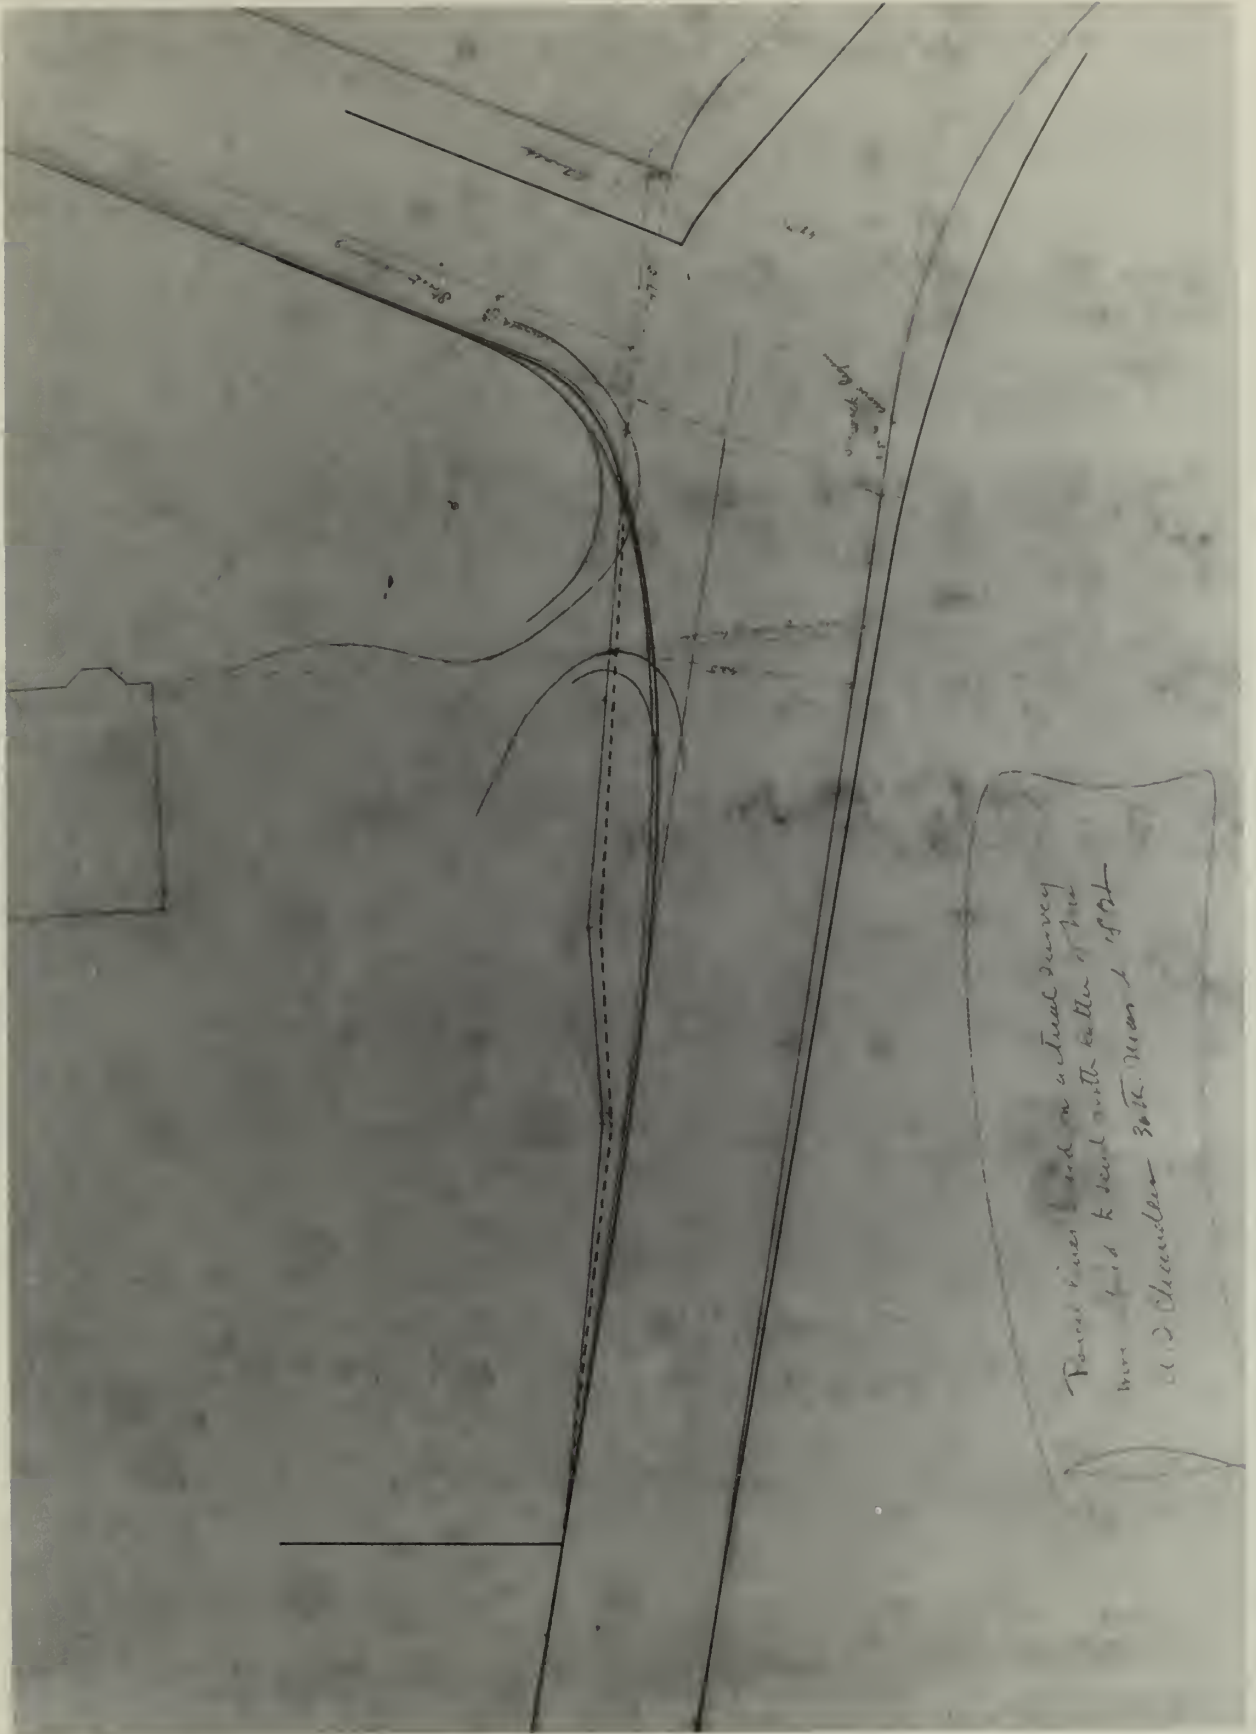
Spruce pole fence: site plan for front driveway arch, circa 1883.
